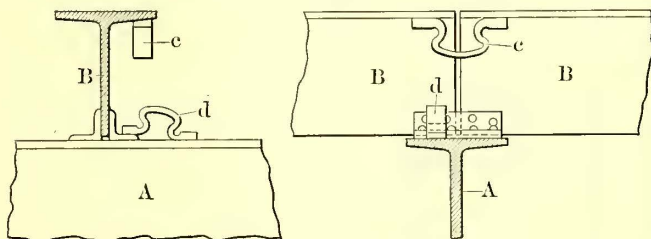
BONDING GIRDERS AT THEIR PLACE OF JUNCTURE
